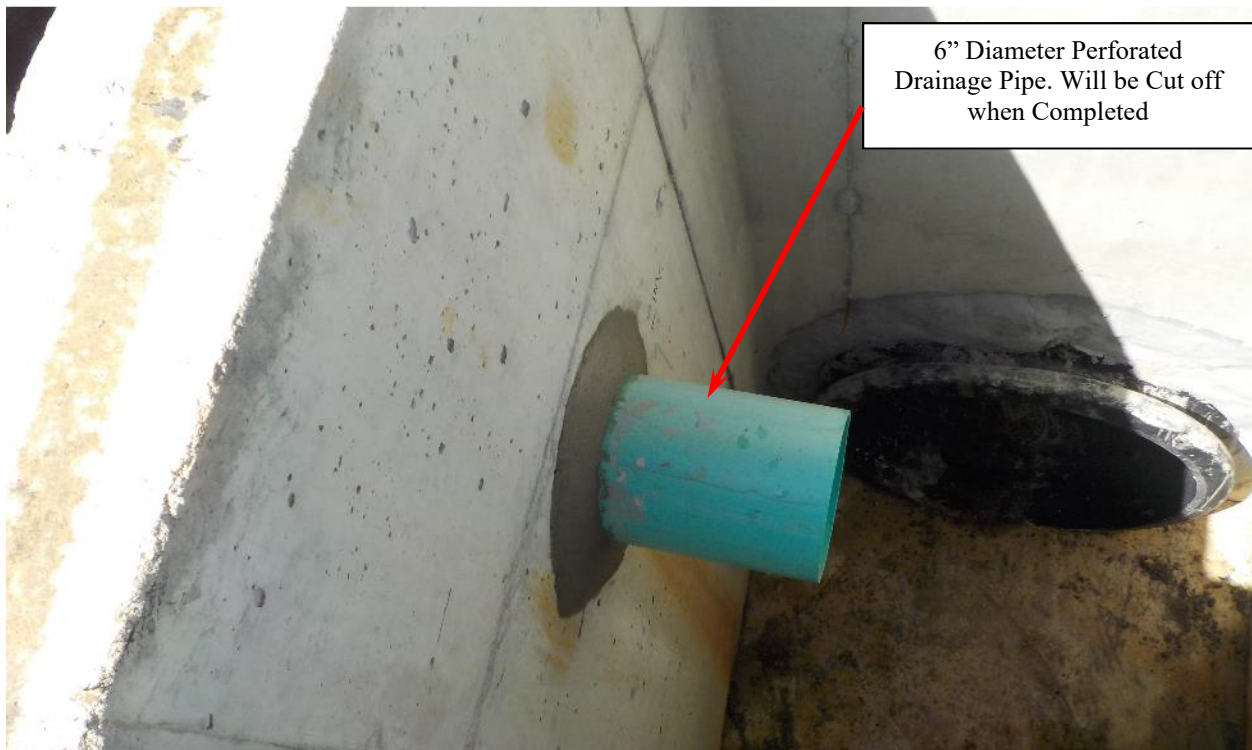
Grouted Subsurface Drainage Pipe in Catch Basin
